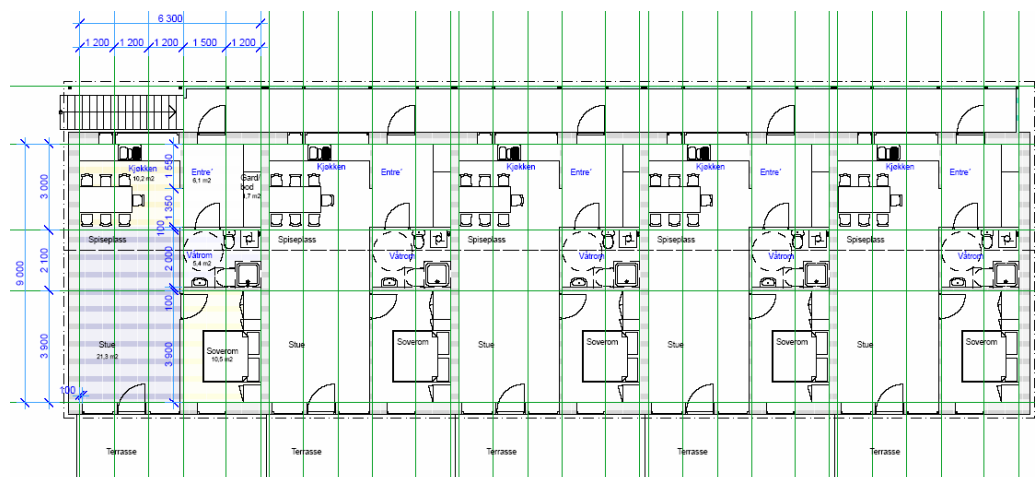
Ground floor of the apartment building at Smestadmoen Park in Lillehammer.
